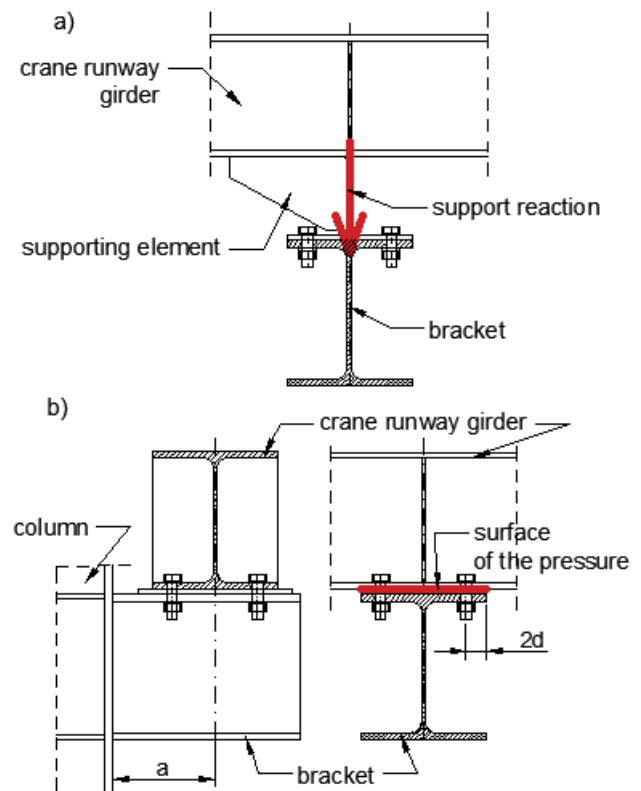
Construction of the crane runway girder connection with the column bracket: a) the example of the used one, b) the new one, analysed.
